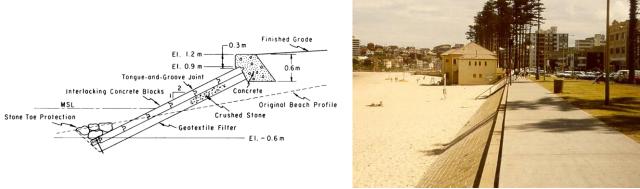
Rigid sloping revetment Left: Typical design for an interlocking concrete slab revetment (source USACE 2011); Right: Promenade and seawall
